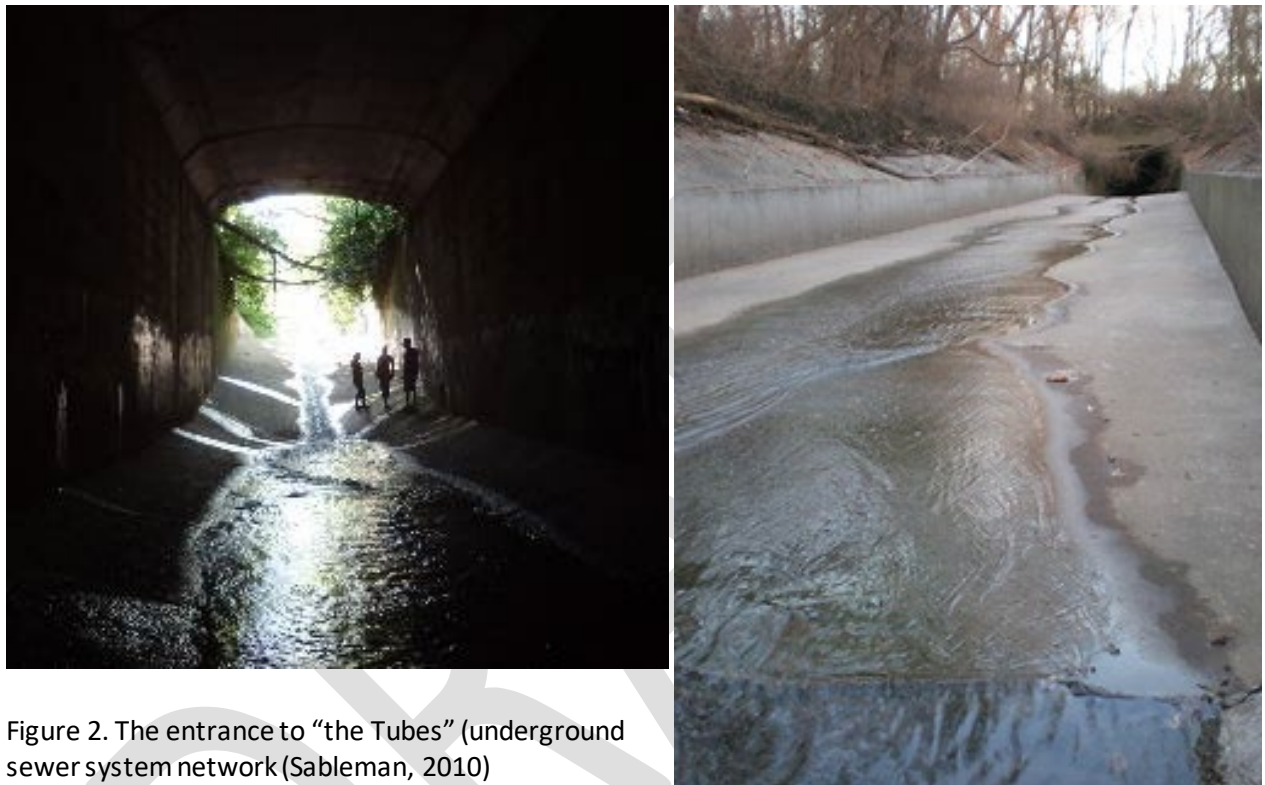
The entrance to “the Tubes” (underground sewer system network) (Sableman, 2010)
